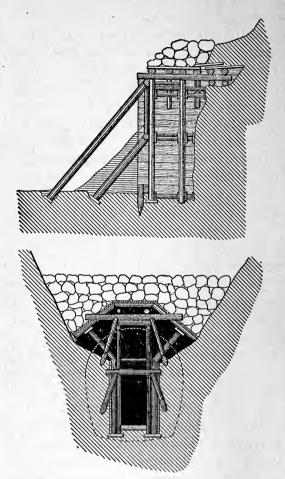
TIMBERING FOR TUNNEL PORTAL.
